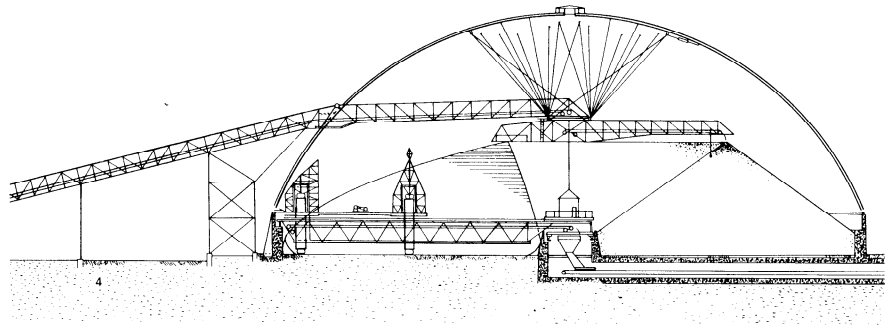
Cross section of covered storage facility. Pile is prepared from twin overhead belt trippers. Twin scrapers reclaim plain or blended pile to ground belt conveyors to load out product.
